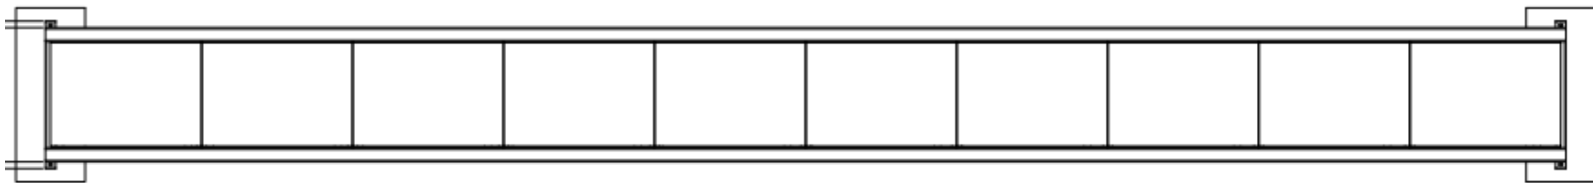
The steel bridge seen from above and marked with lines where the floor beams are placed.
